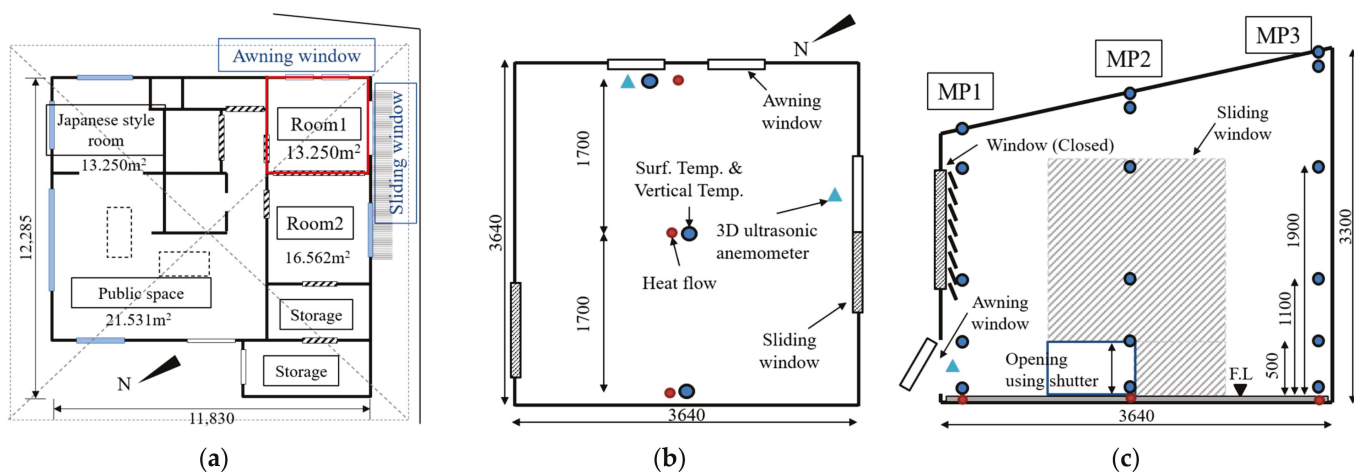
Floor plan and measurement points: (a) floor plan of the target building; (b) measurement points (floor plan); (c) measurement points (cross-section) [33].
